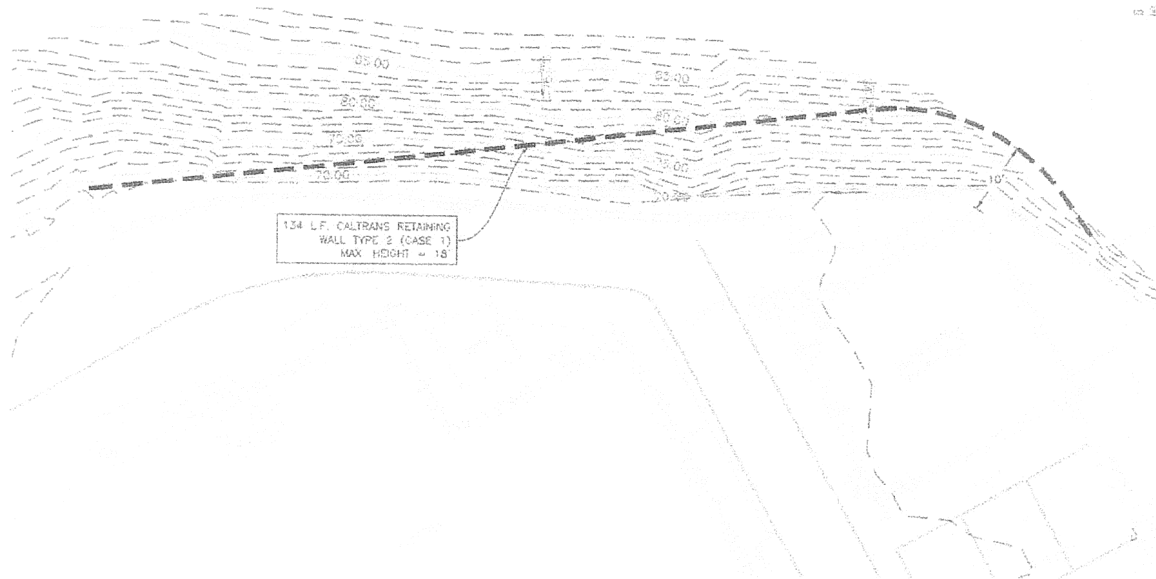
Wall alignment analyzed for CALTRANS typical tapered retaining wall design.
